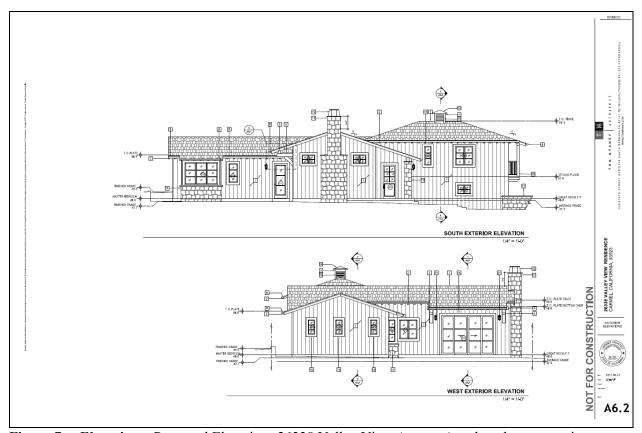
Elevations: Proposed Elevations 26338 Valley View Avenue (south and west exterior elevations).
